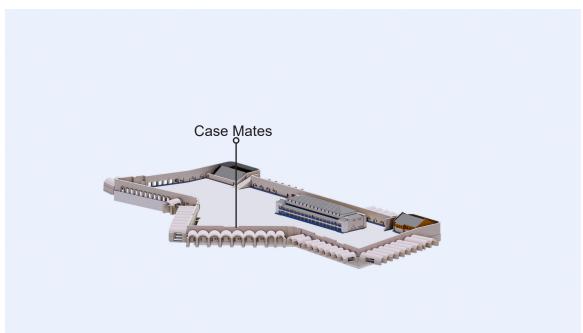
The Case Mates are constructed of Granite pier walls with brick arch roofs. This wall systems is oriented perpendicularly to the Parade wall and subdivides the Forts interior spaces.
